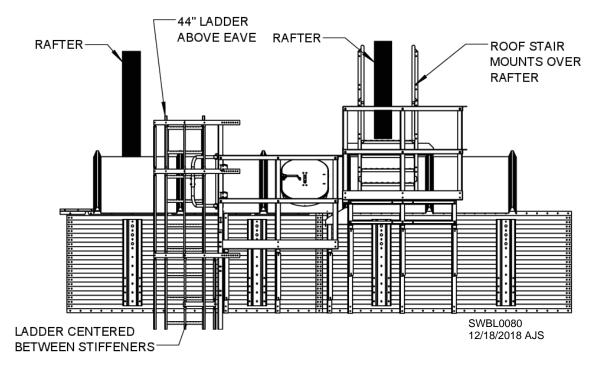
Ladder & platform locations with 2 stiffeners & 3 roof sheets per sidewall sheet
